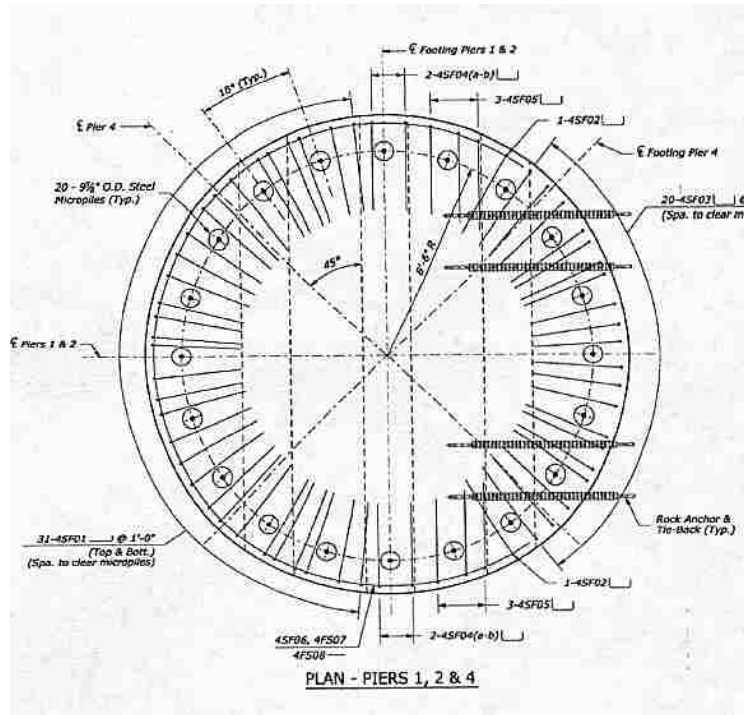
Footing Plan (Corvern Engineering, 2010).
